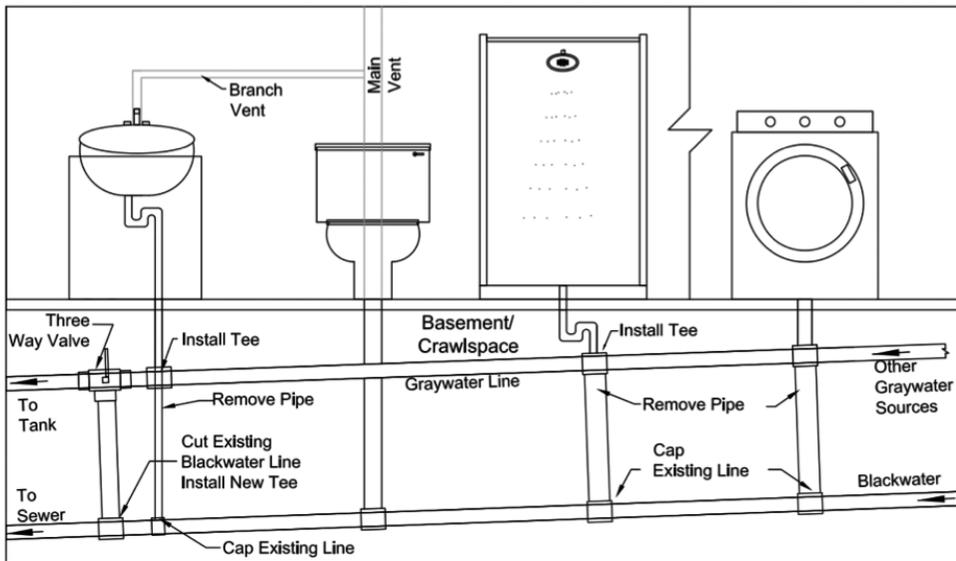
Retrofit Construction for a First Floor Dual Plumbing System.
